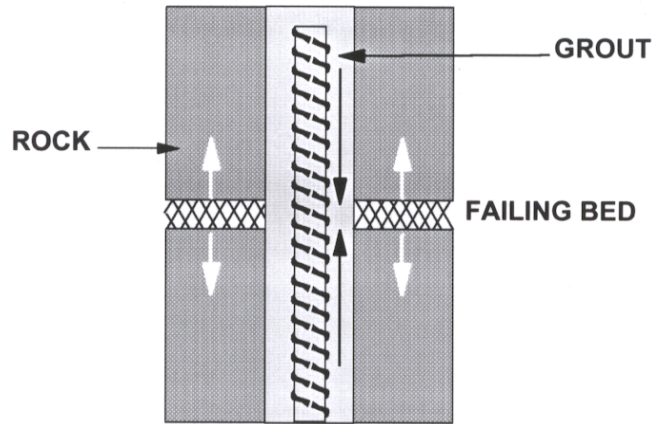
Tension in a fully grouted bolt caused by dilation of a failed roof bed.
